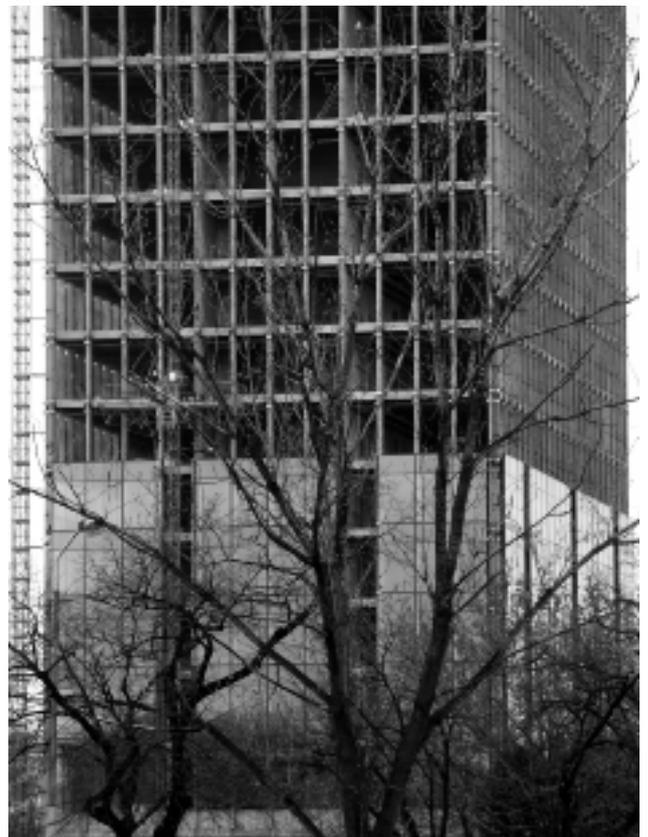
Reconstruction of the CK building. (Photo by author, 2004).
